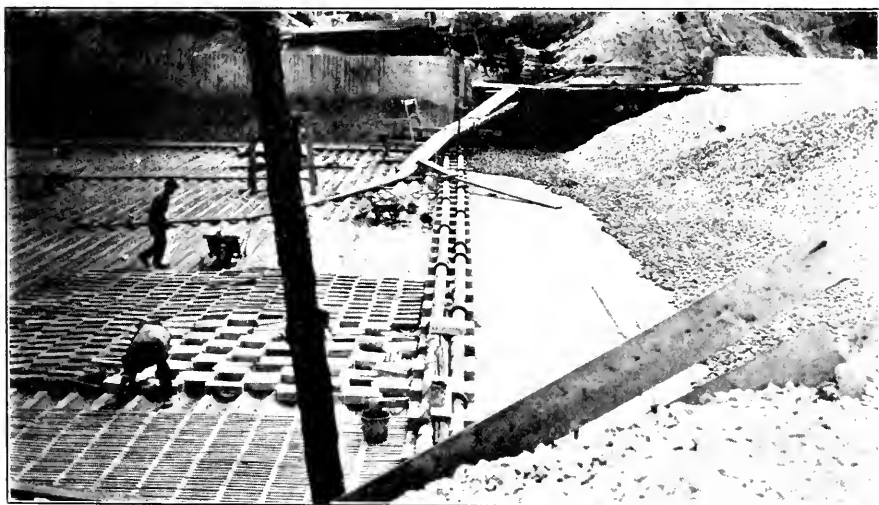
FILTER FLOOR UNDER CONSTRUCTION.
